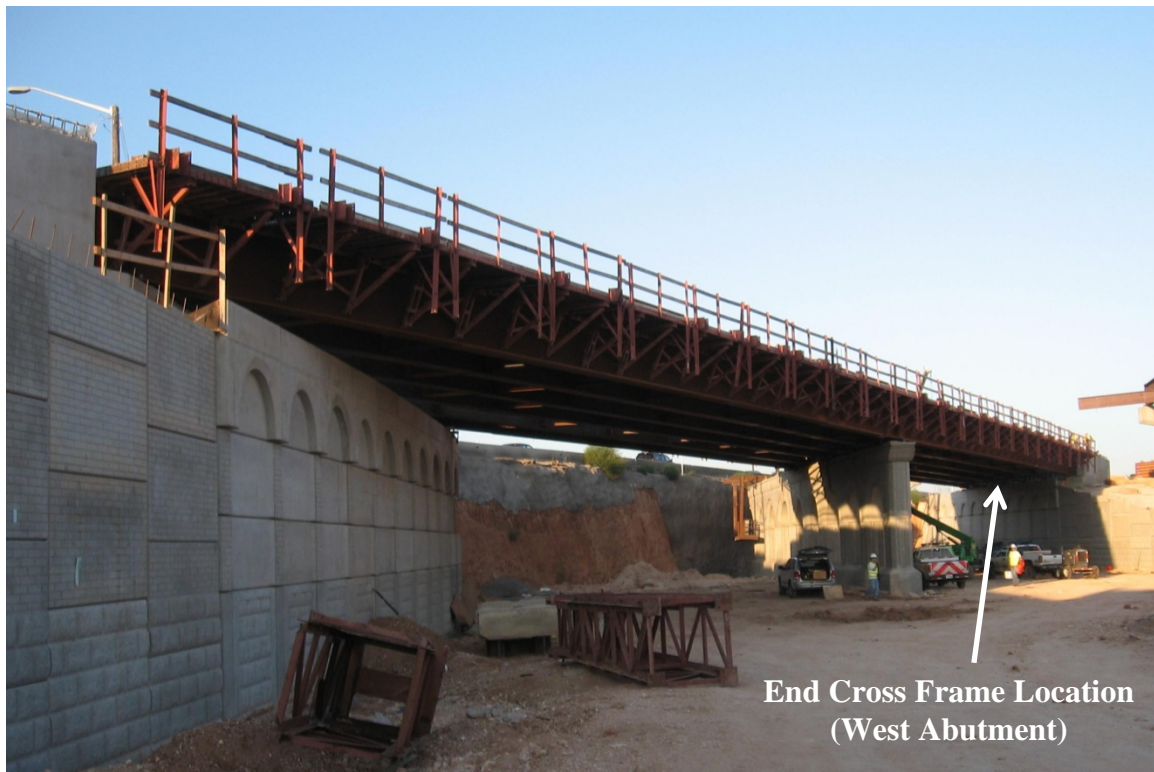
Elevation View of the 19th Street Westbound Bridge
